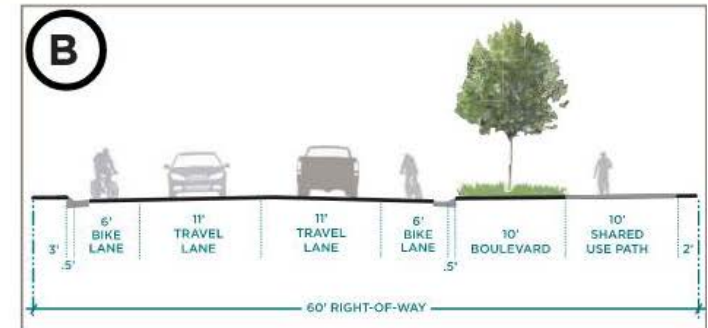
Preferred Alternative East Broadway Segment 'B' Typical Section Looking East
